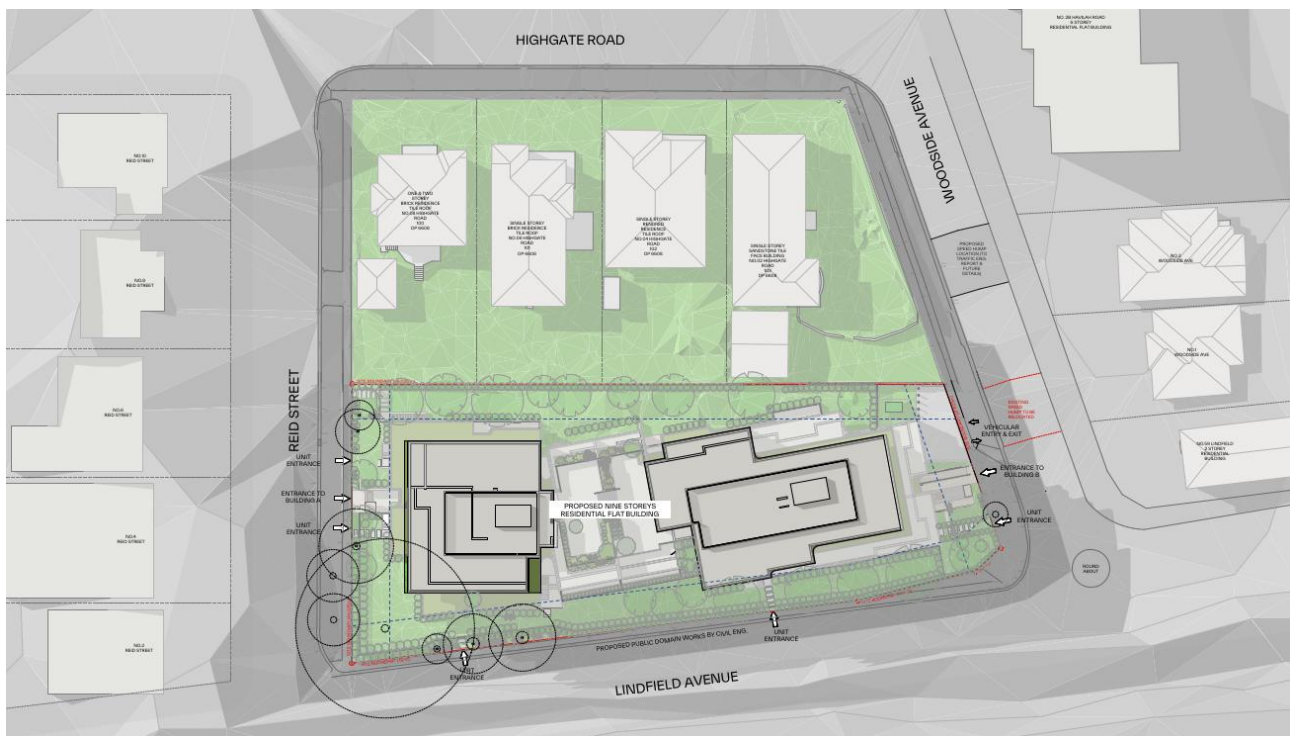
Site Plan (PBD Architects, DA004 Issue 03)
